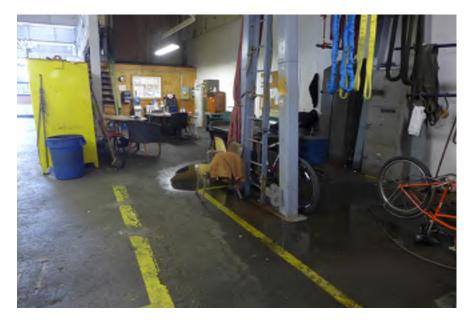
Building 109, Asphalt Floor at Rigging/Break Room. Note ponding.
